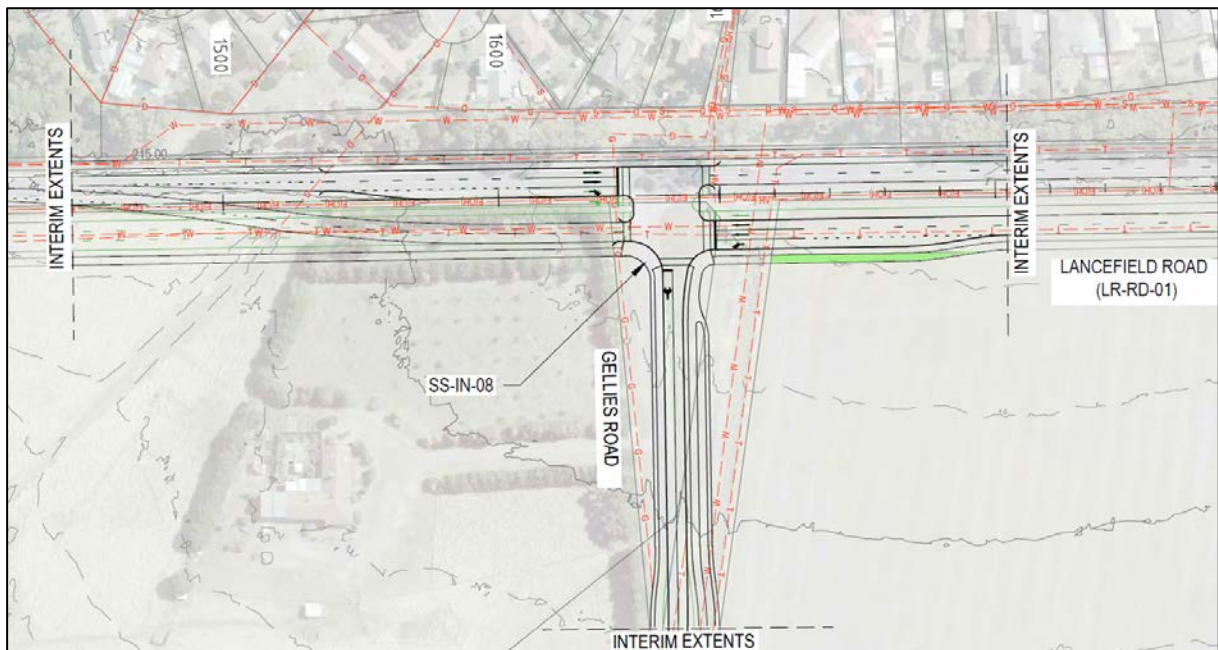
Lancefield Road/Gellies Road Interim Signalised Intersection – SS-IN-08
